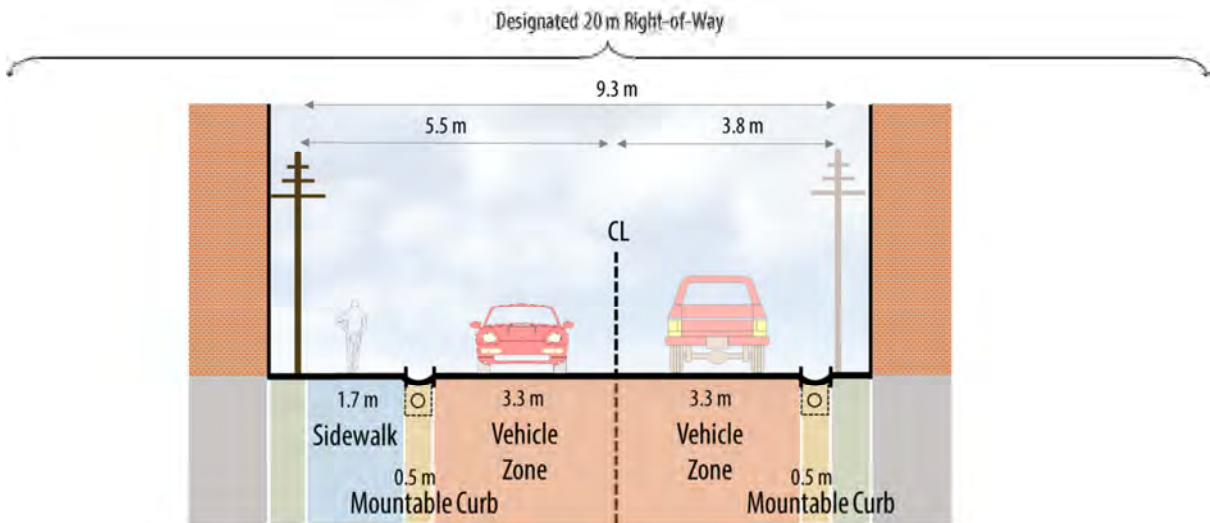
9.3 m Platform Semi-Rural Cross-Section with Sidewalk for Belfountain Village (Shaws Creek Rd. to Mississauga Rd. / Old Main St.)
